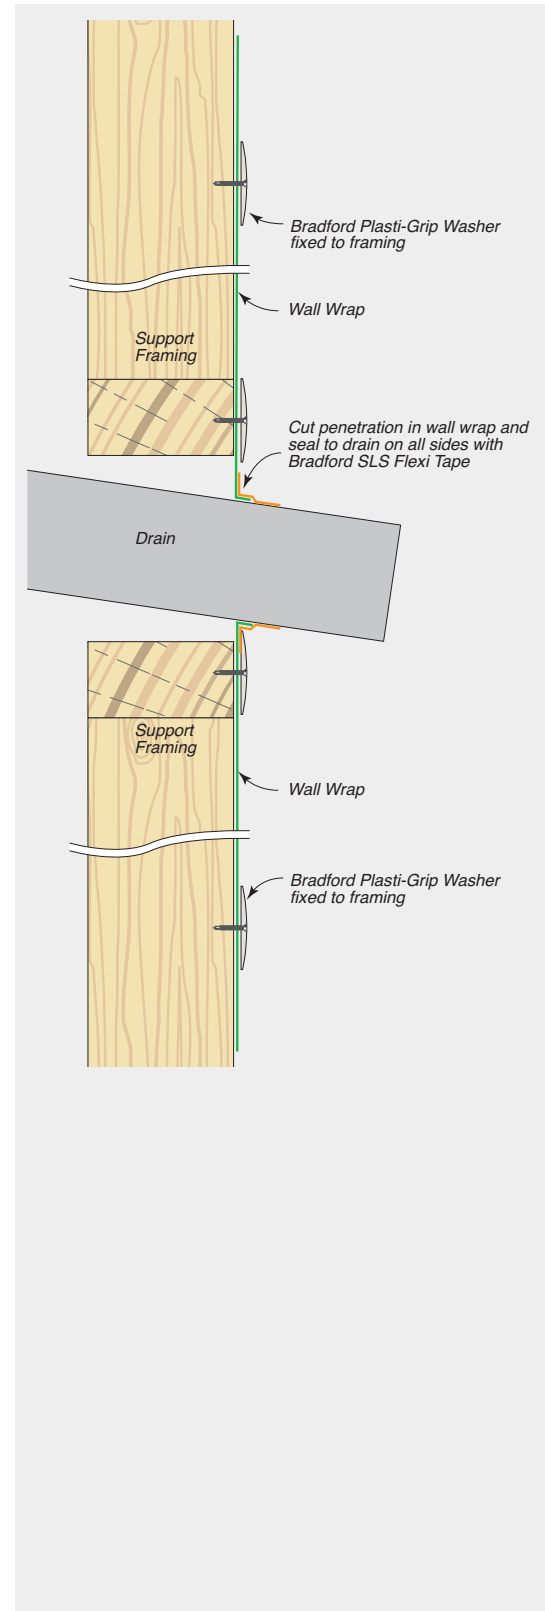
Wall Wrap Installation at Drain Penetration – Timber or Steel Framing
